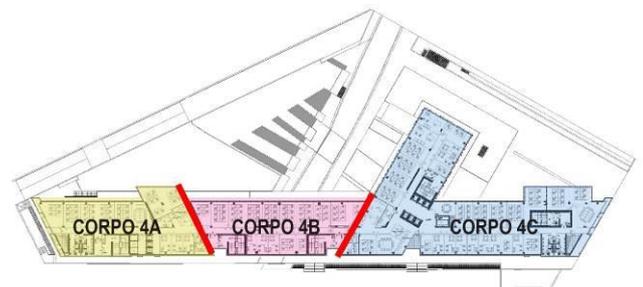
Building ENI4: structural joint in external levels /Edificio ENI4 posizioni giunti nei piani fuori terra.
